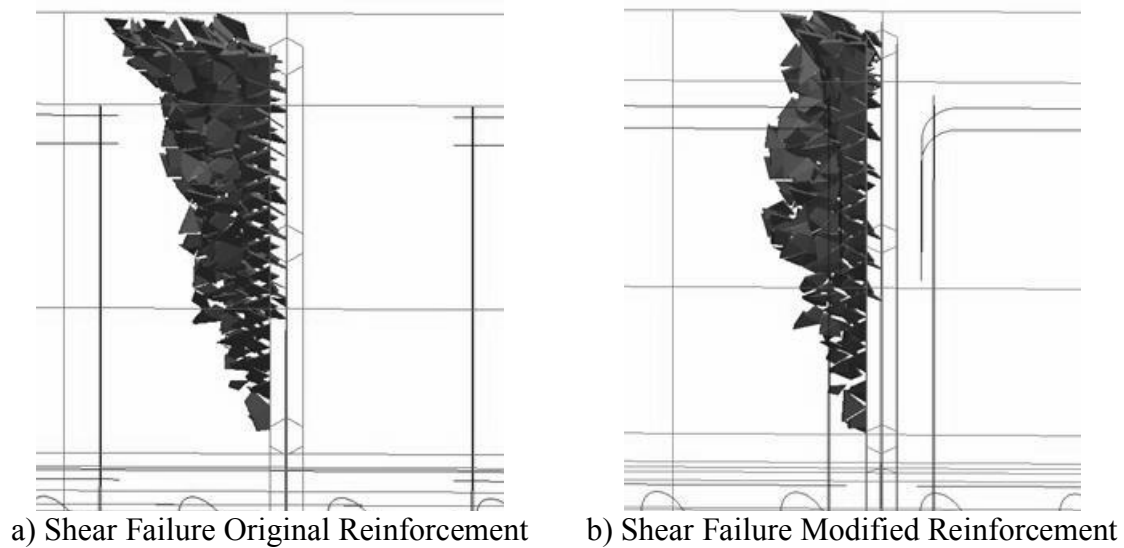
Barrier Reinforcement Study, Test Configuration 3
